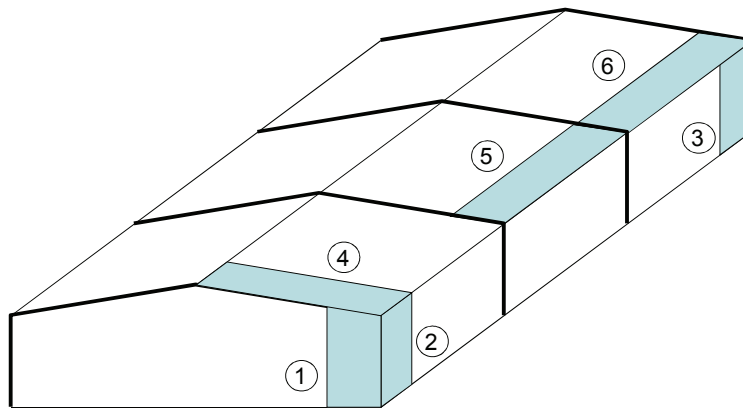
Potential Drift Damage Zones in a Typical Metal Building
